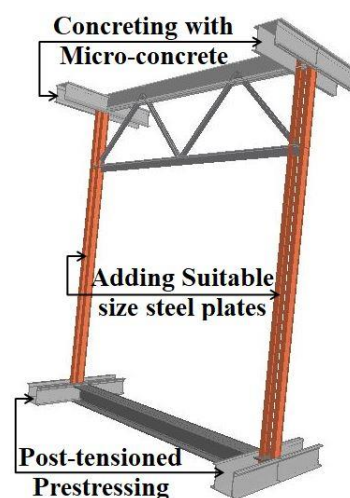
Conceptualization of concrete-filled prestressed (CFP) truss bridge
